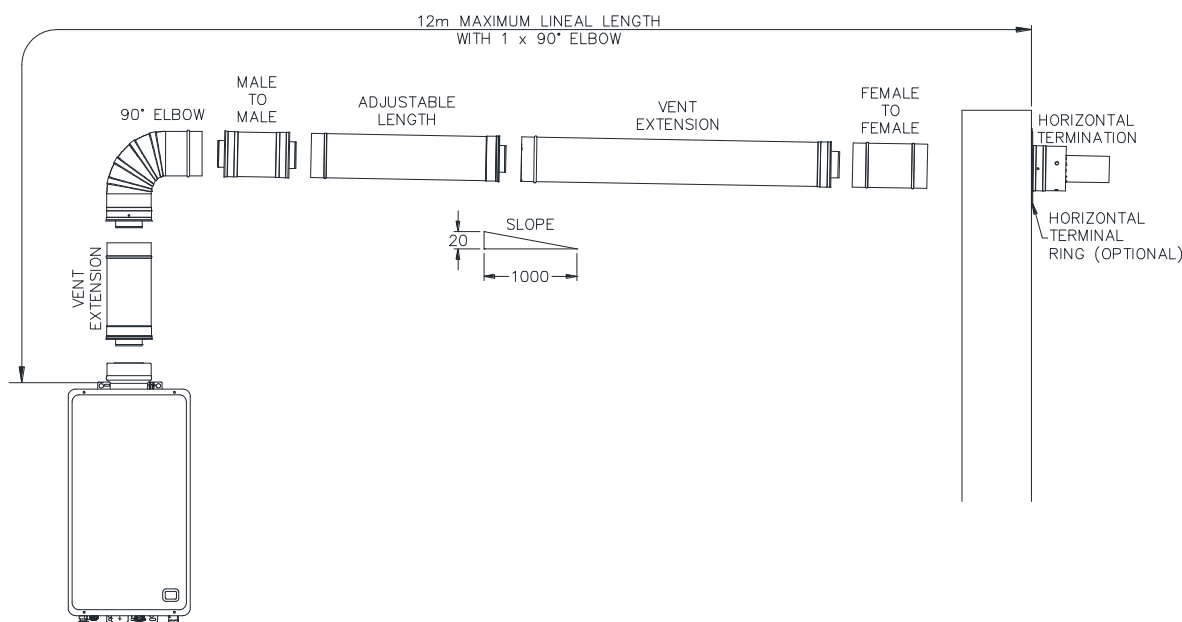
Typical Installation – Horizontal Terminal with One Bend
